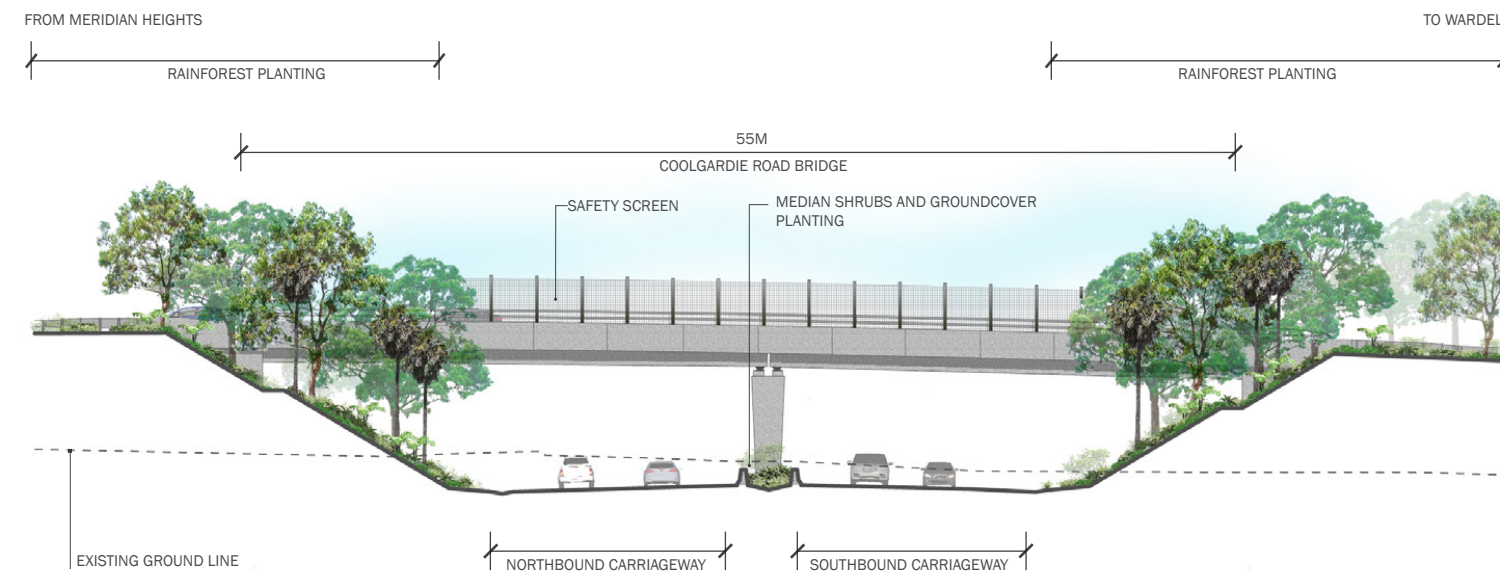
Coolgardie overpass - elevation (Scale 1:400)
